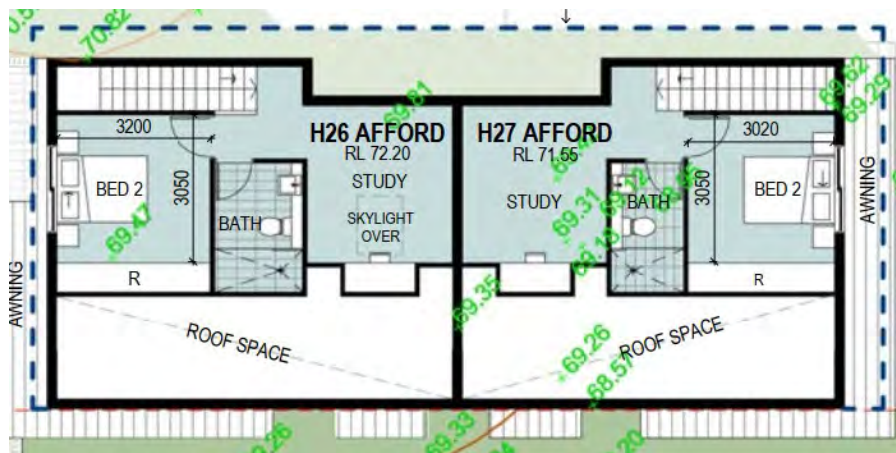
Floor plan extract depicting studies provided with dimensioned and located for simple conversion into additional bedrooms
